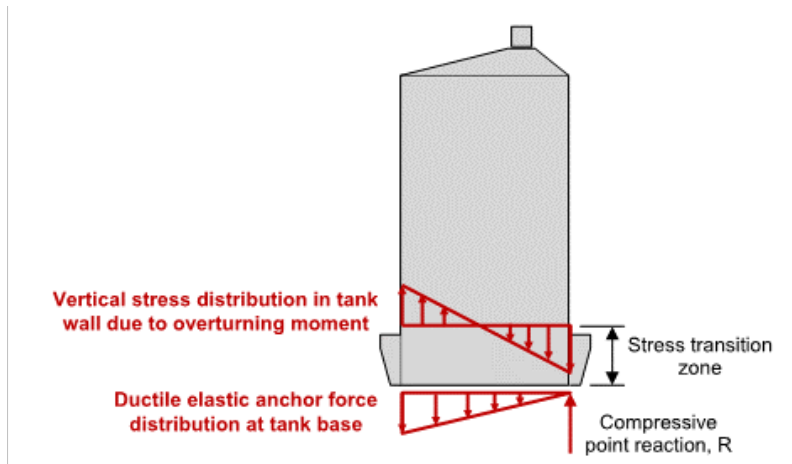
Stress distribution in tank wall and at base for tanks with ductile hold-down anchors (Source: Au et al. 2015)
